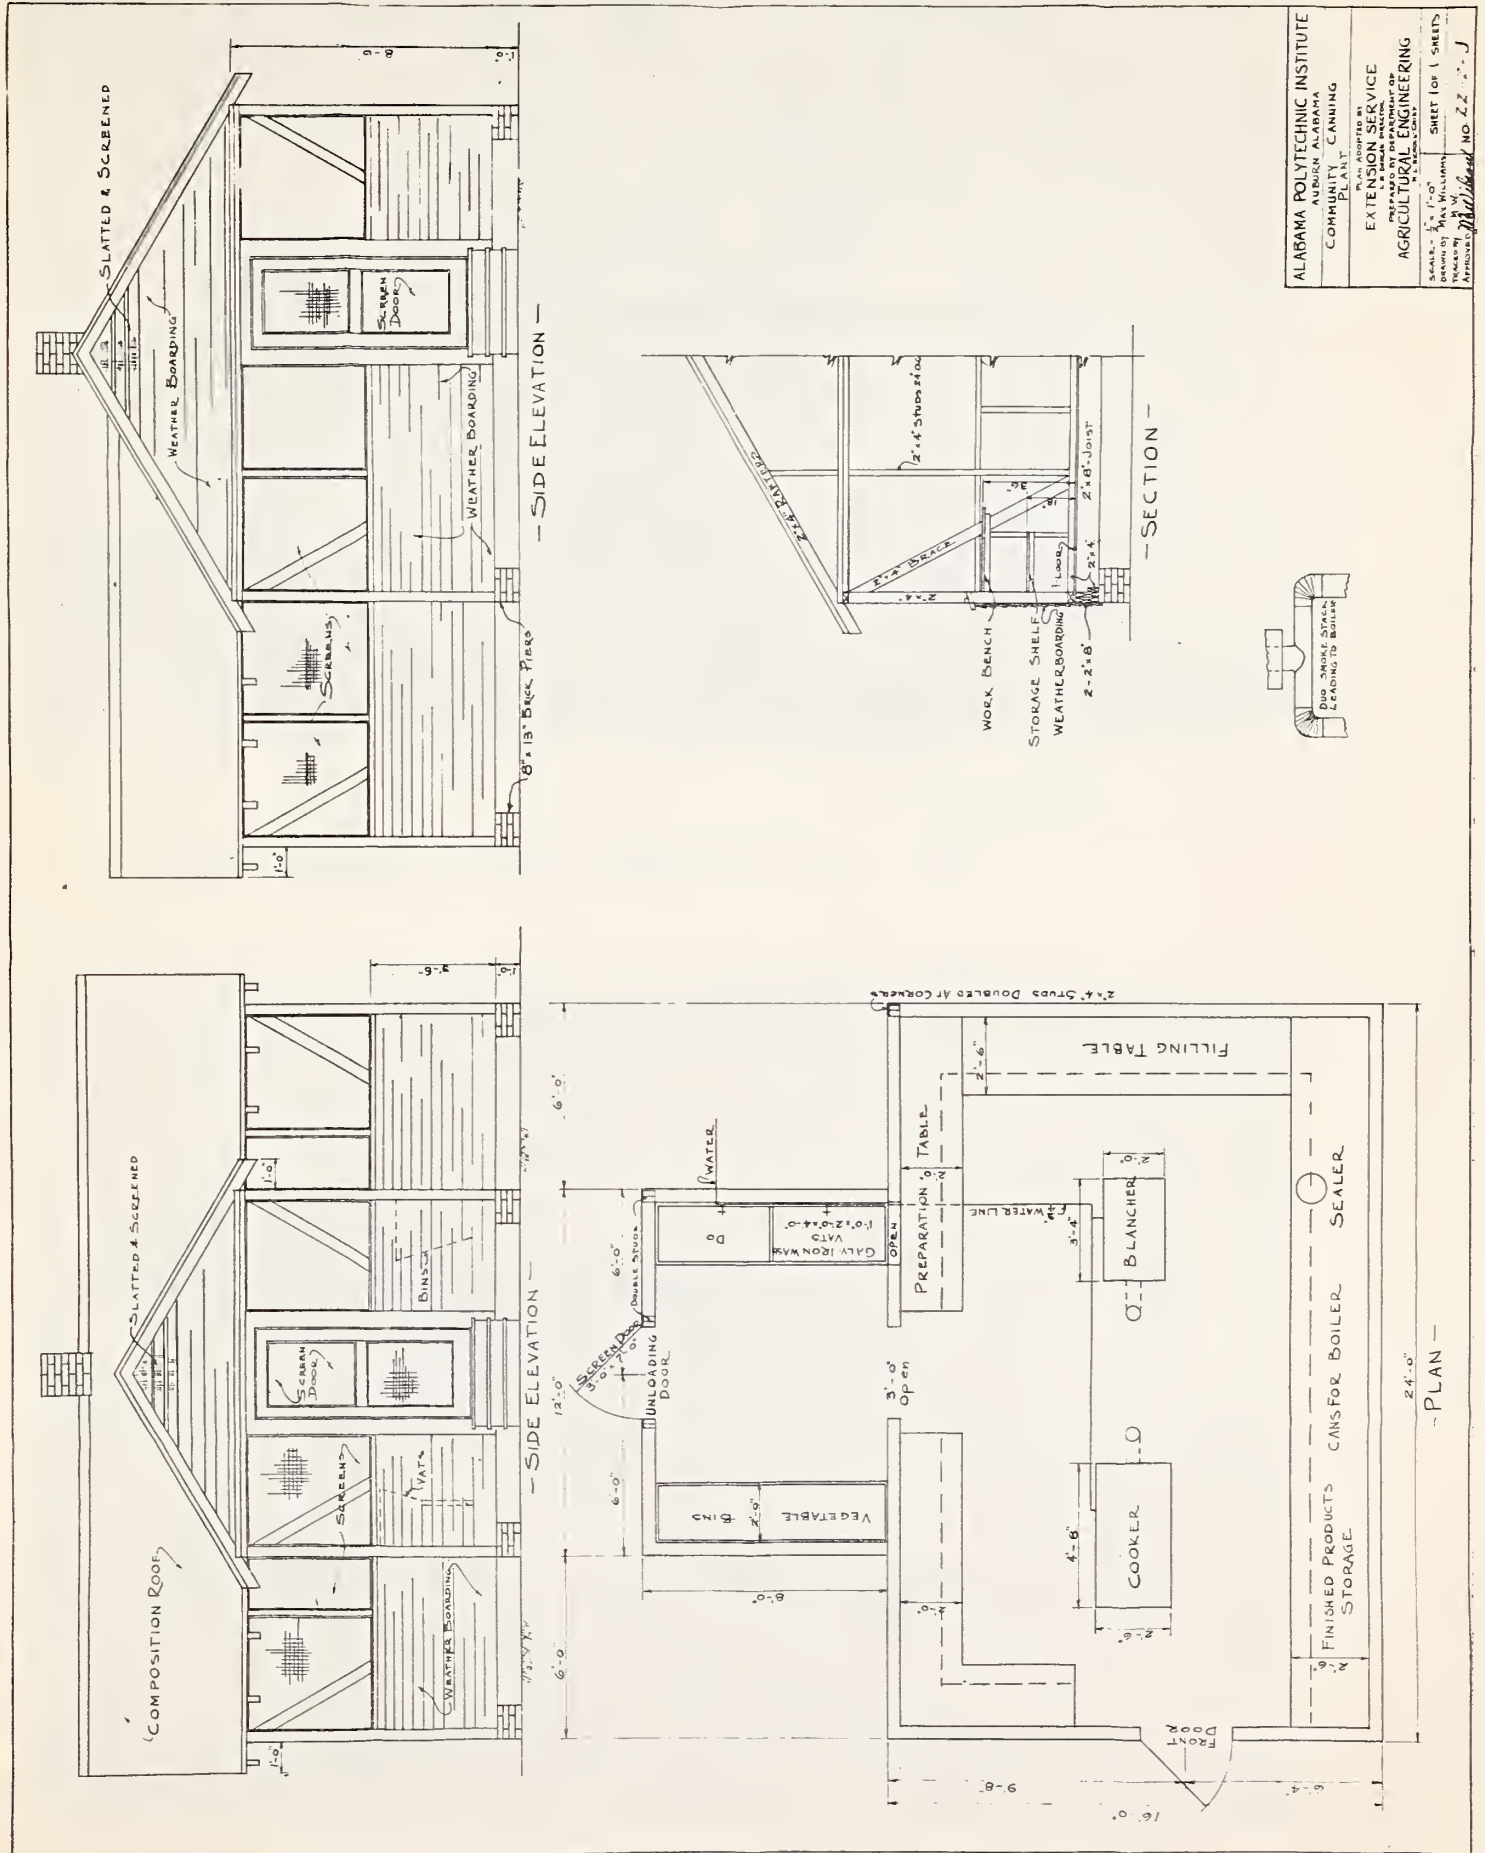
ELEVATIONS AND FLOOR PLAN FOR A SMALL COMMUNITY CANNING PLANT IN A SEPARATE BUILDING. (ALABAMA EXTENSION SERVICE.)
